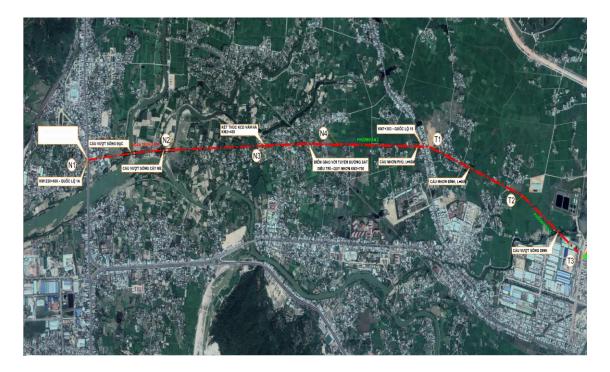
Sub-component 2 - Section from the Highway 19C to Quy Nhon Port
